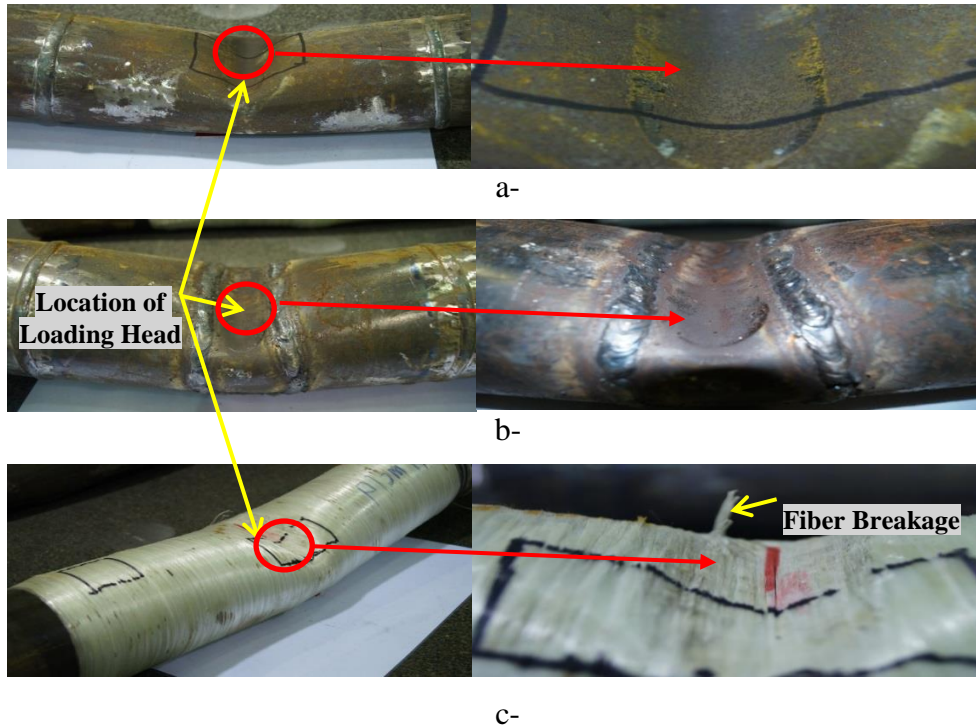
Three-point bending post-failure images; a- steel pipes with two welding lines, b- four welding lines, c-wrapped with composite layers.
